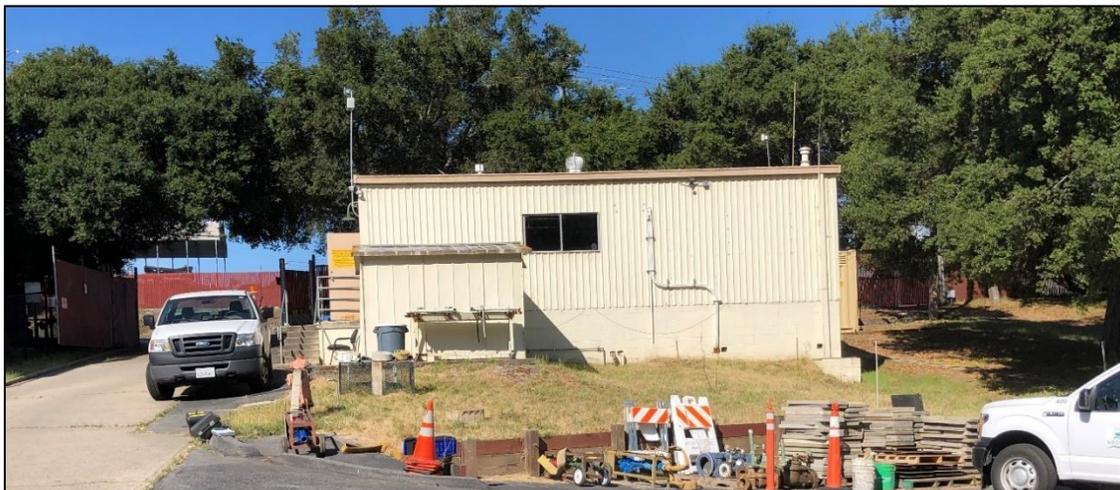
Rear of Coast Pump Station showing view looking northeast (IMG\_0162).
